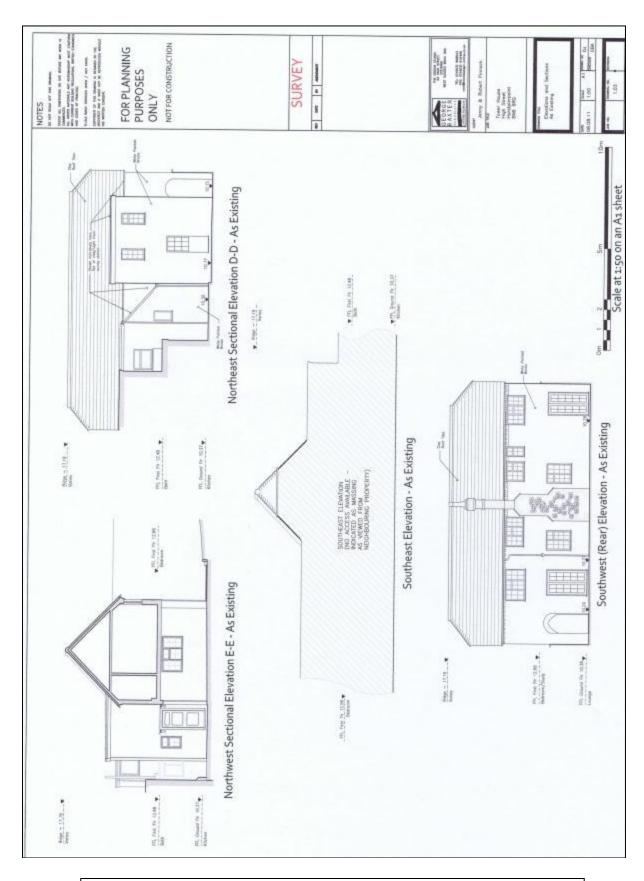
Tower House, Hurstpierpoint: Existing Elevations of Tower House (Adapted from architects drawing)
